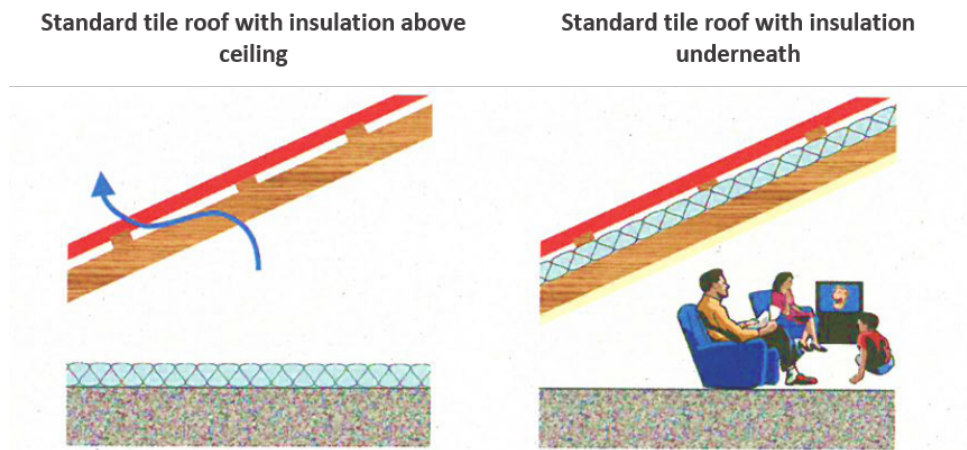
Constructive details of tiled roof insulation systems, adapted from [8]
